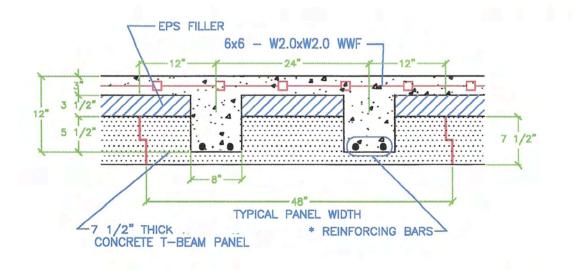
RPB - 4 & FPB - 5 \* 2X THE BAR DIAMETER ABOVE BOTTOM OF POCKET
